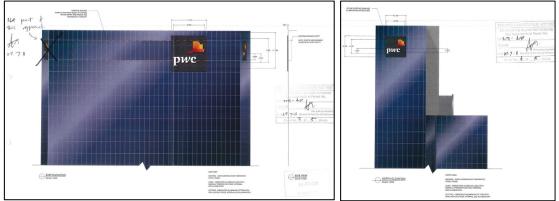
Endorsed east elevation signage (left) and north elevation signage (right) under planning permit TP-2011-408
